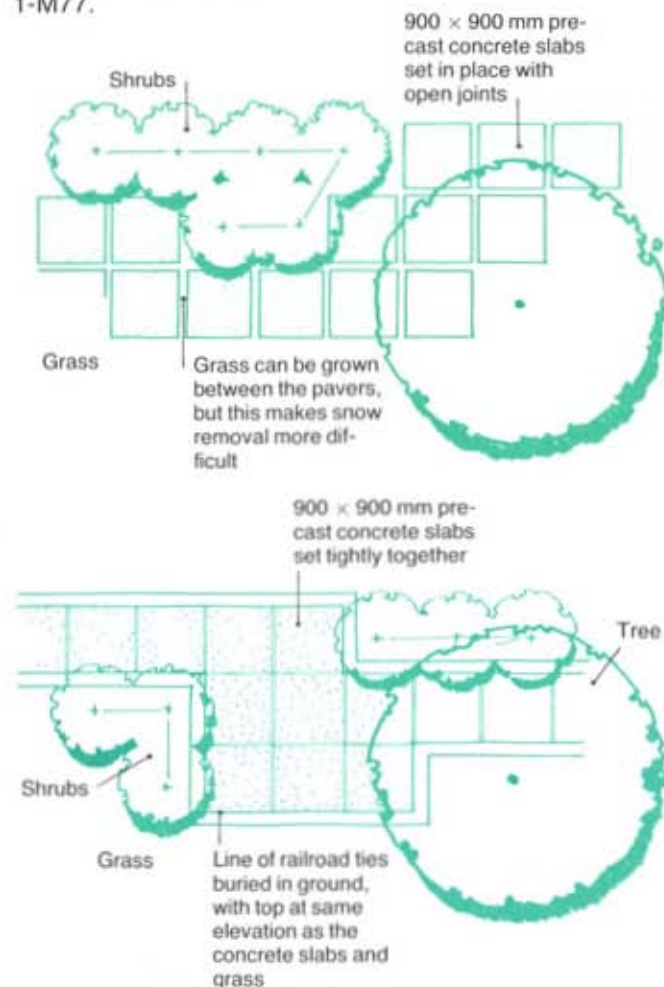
Precast concrete paving blocks are easily laid into a grid paving pattern, and can be set with open or closed joints.
